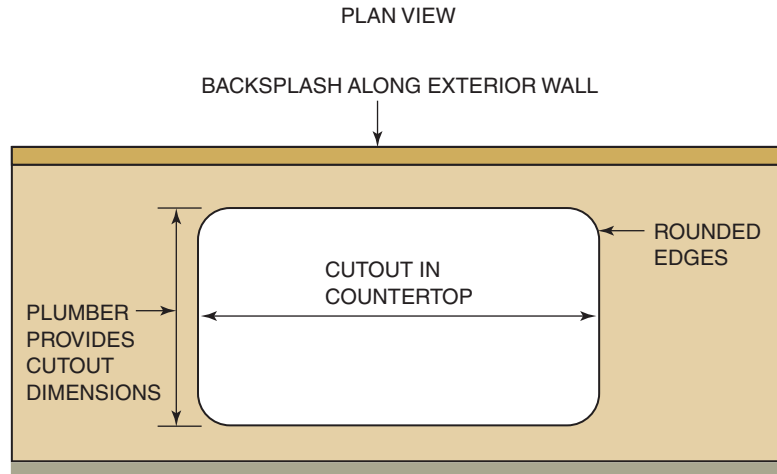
A countertop is cut to exact dimension to receive certain types of kitchen sinks.
